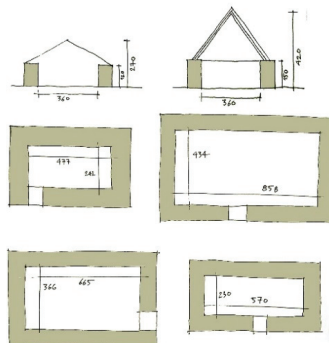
Cross-sections through two types of gladas and examples of plans of gladas of different dimensions, drawing: A. Kapetanović.
